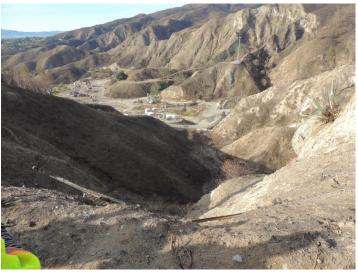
Deck C Access Road from Oil Field: December 11, 2019
